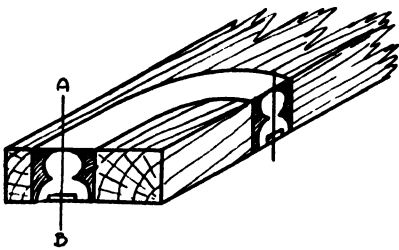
Handrail Wreath to be Cut from a Thick Plank
